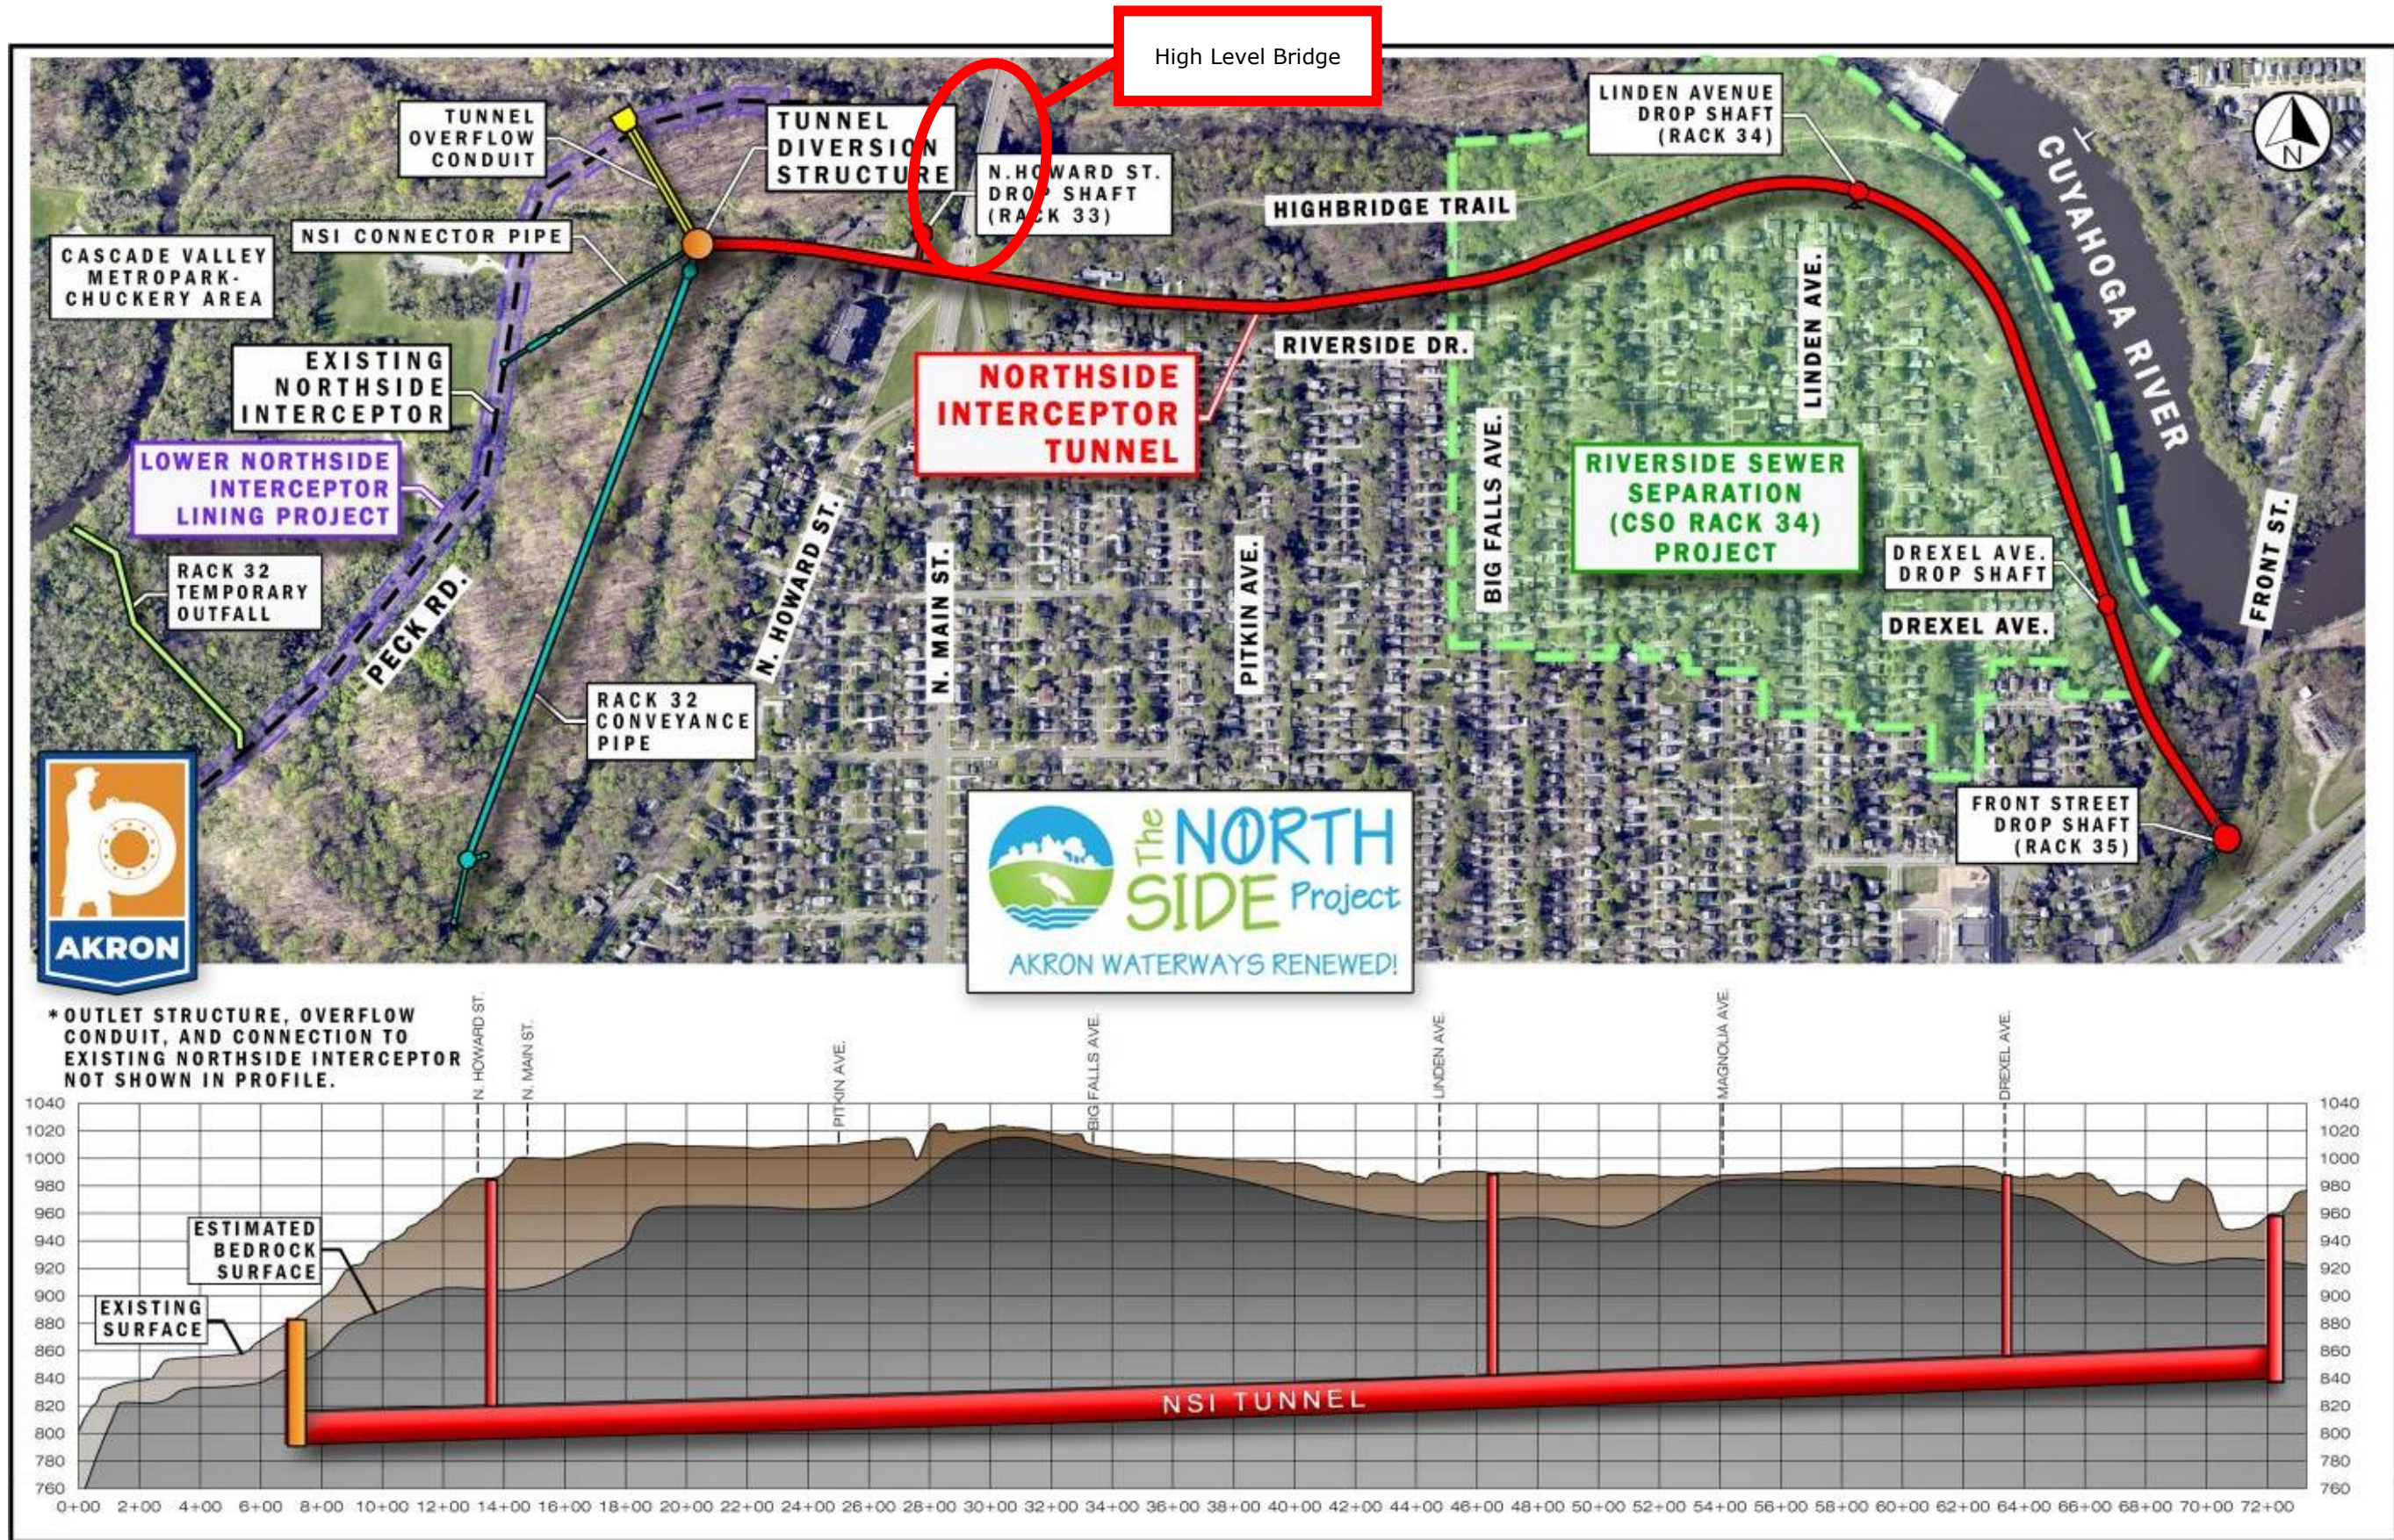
Northside Interceptor Tunnel Project Site Plan.
